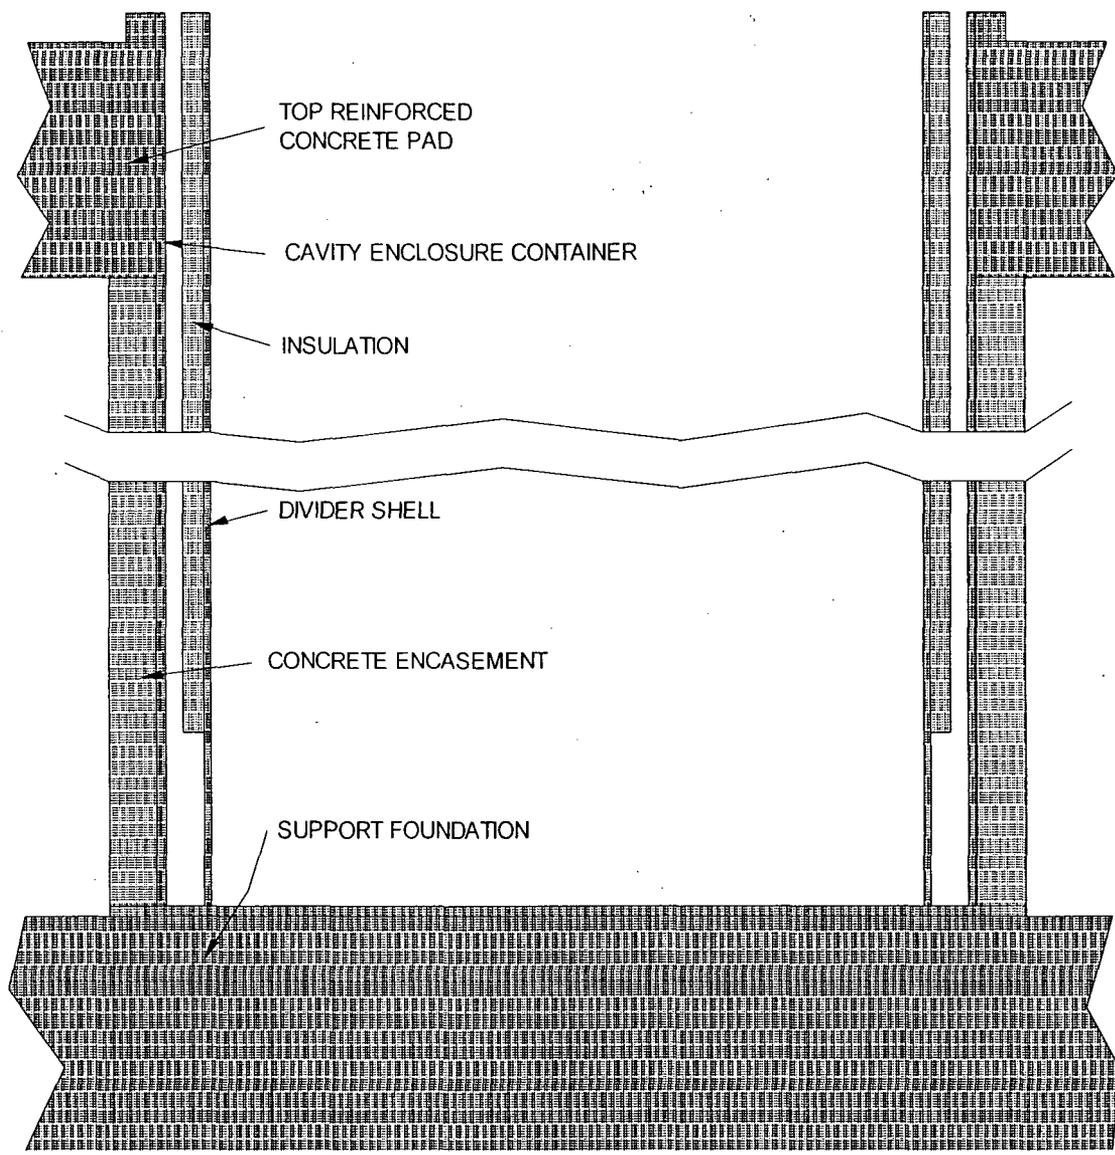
TYPICAL CONCRETE ENCASEMENT OF THE CEC
